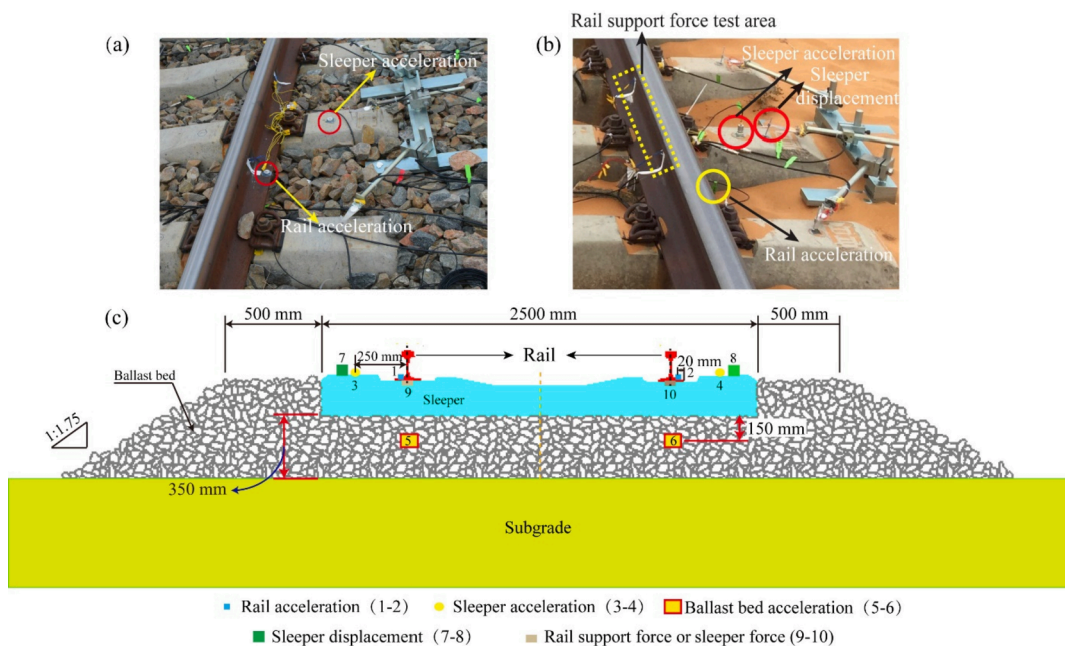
Setup for vibration test: (a) clean section, (b) sandy section, (c) layout of measuring points.
